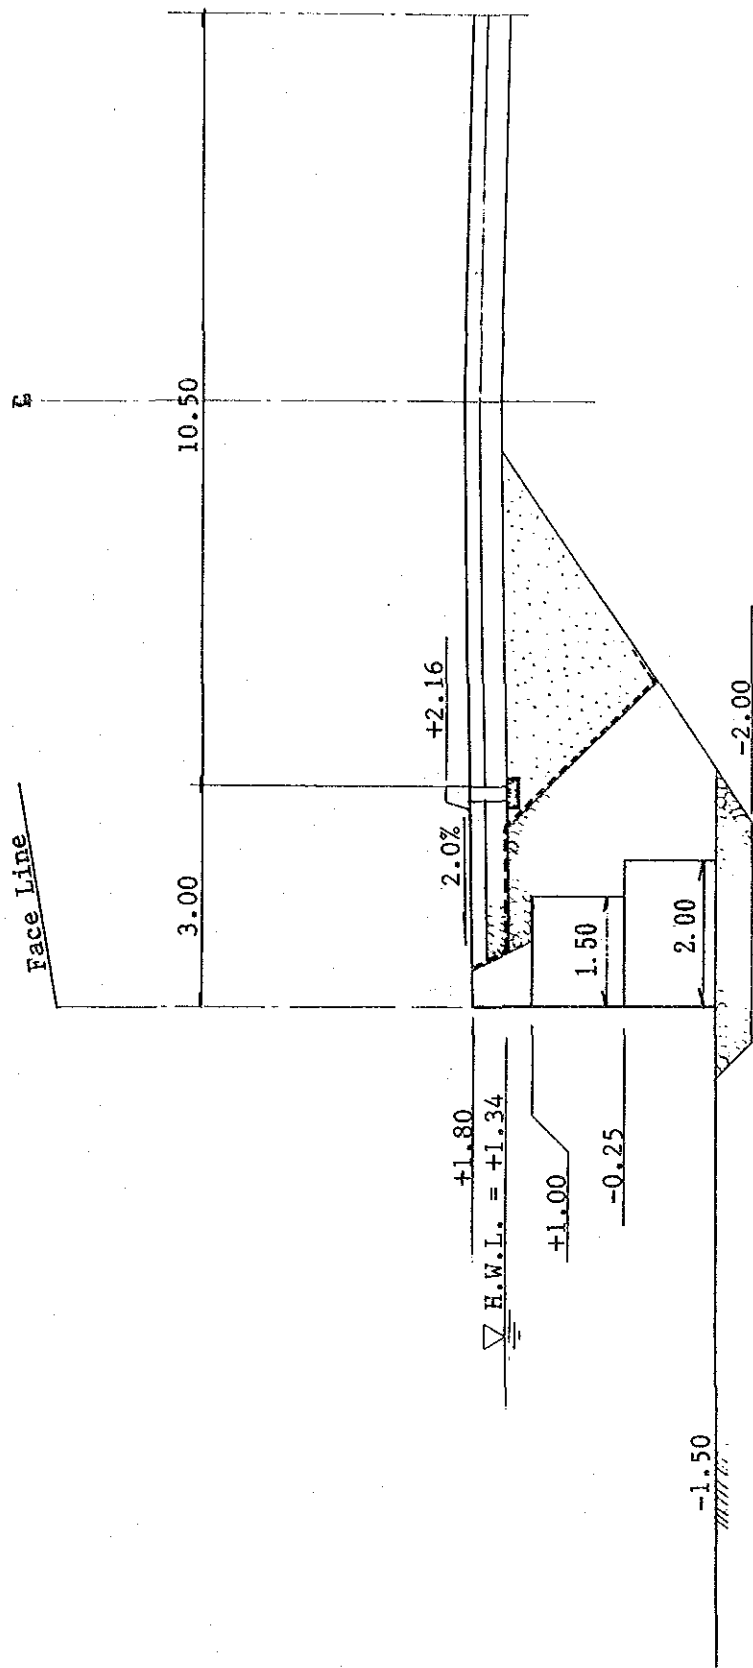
Typical Section of South Coast : Center Quaywall (S=1:100)
